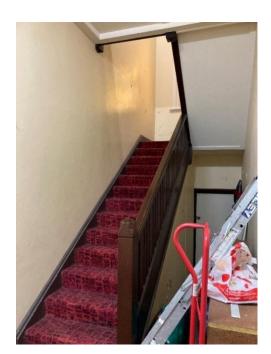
Dog-legged timber Staircase adjacent to the entrance hallway.
